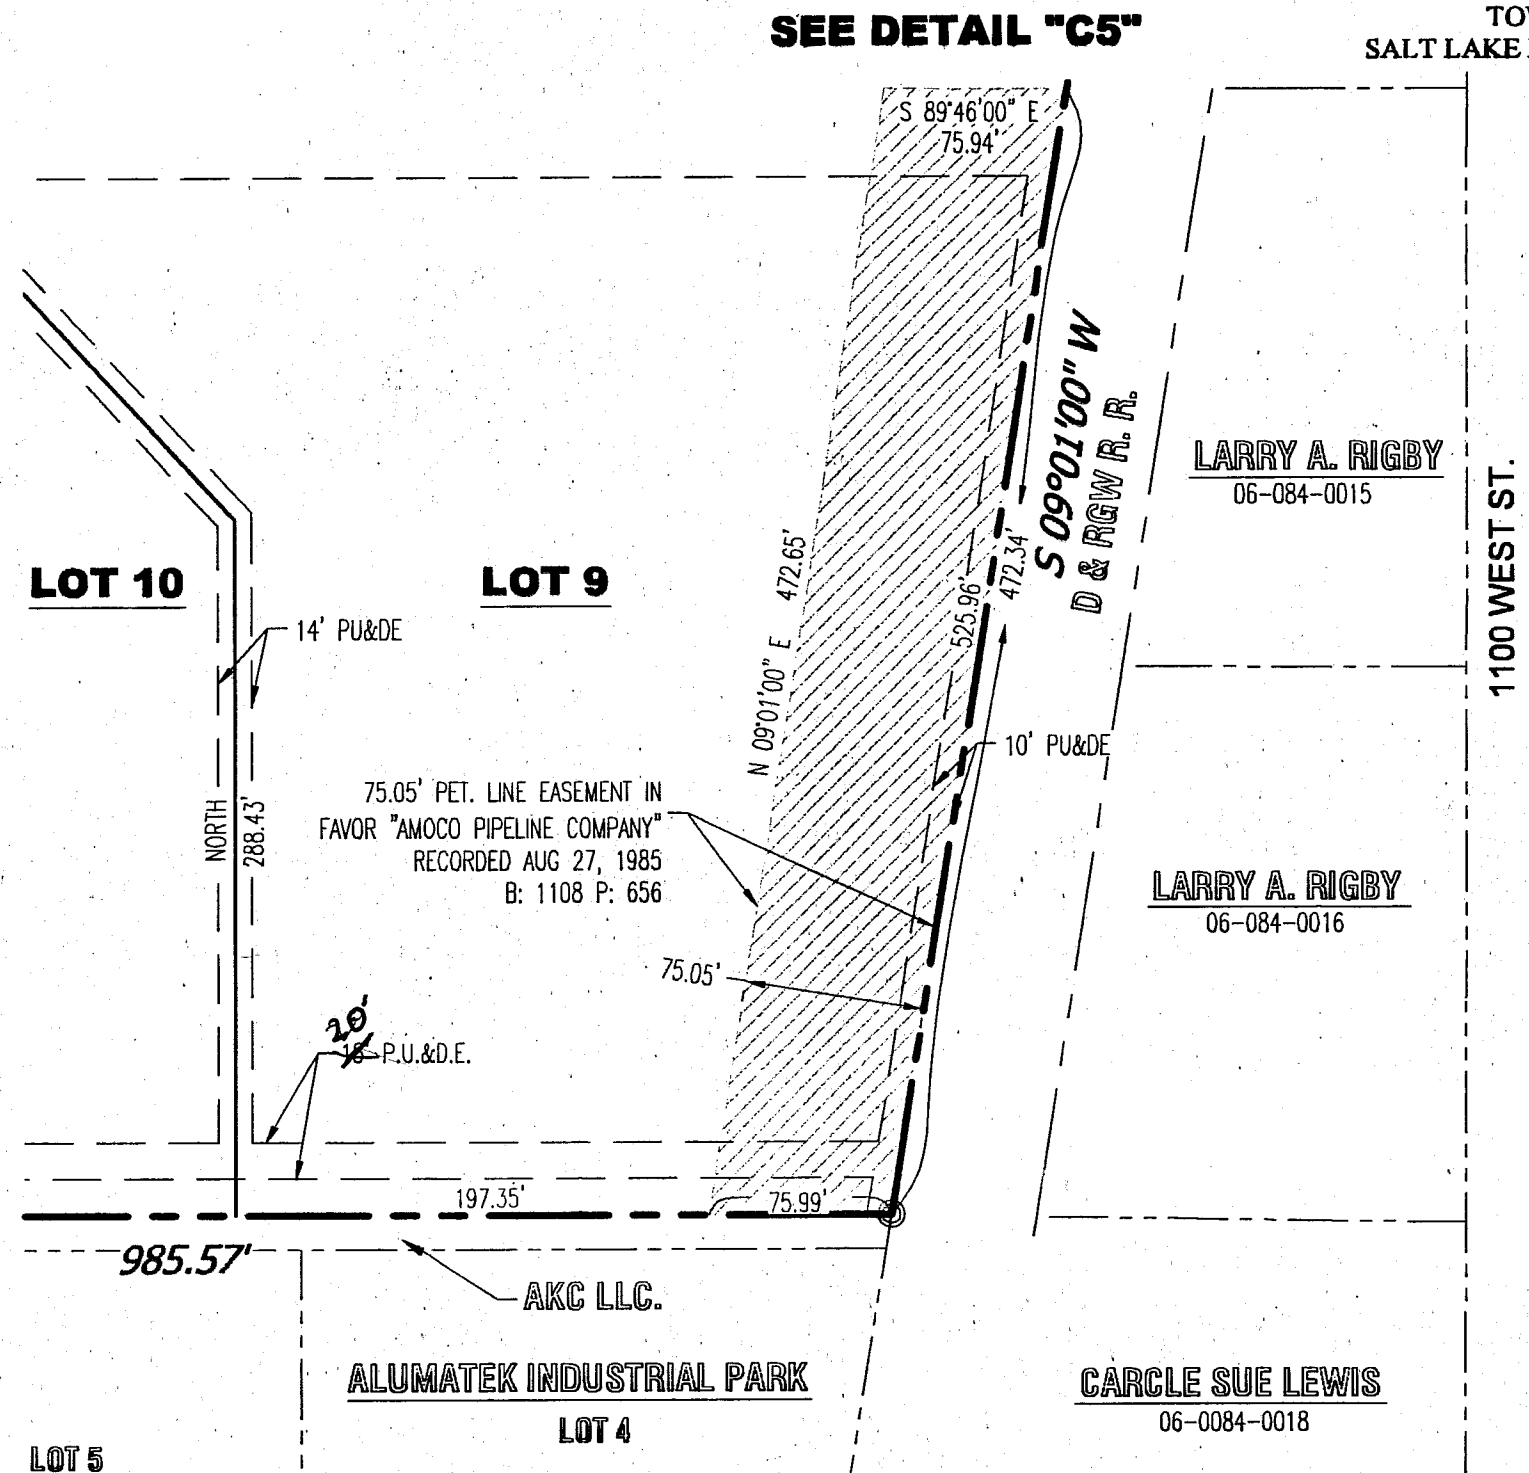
" (SALT LAKE PIPELINE COMPANY)
